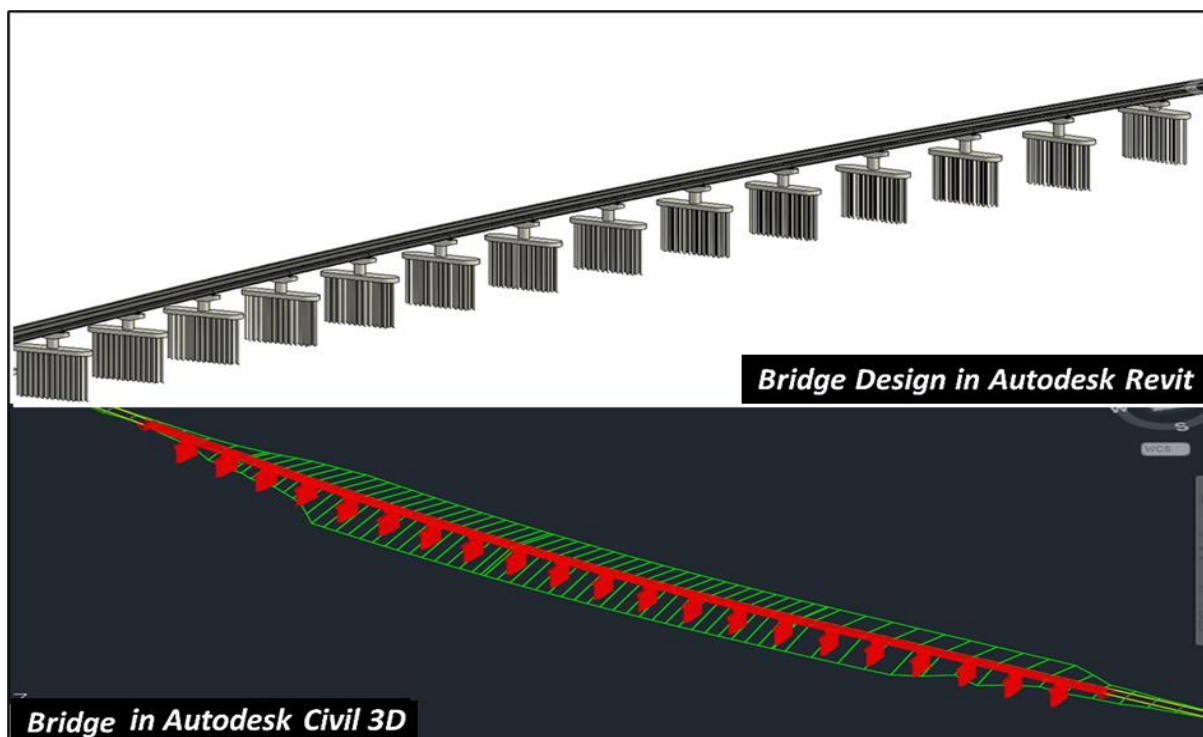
Bridge Geometry Imported & Linked from Autodesk InRoads to Revit & Civil 3D 2022
